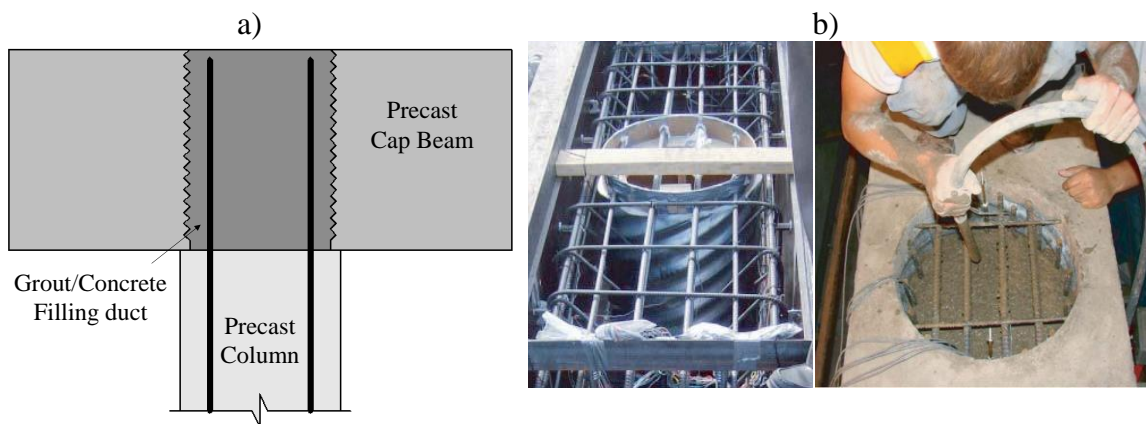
Pocket connection a) Schematic of the connection b) Concreting of cap pocket connection [14].
